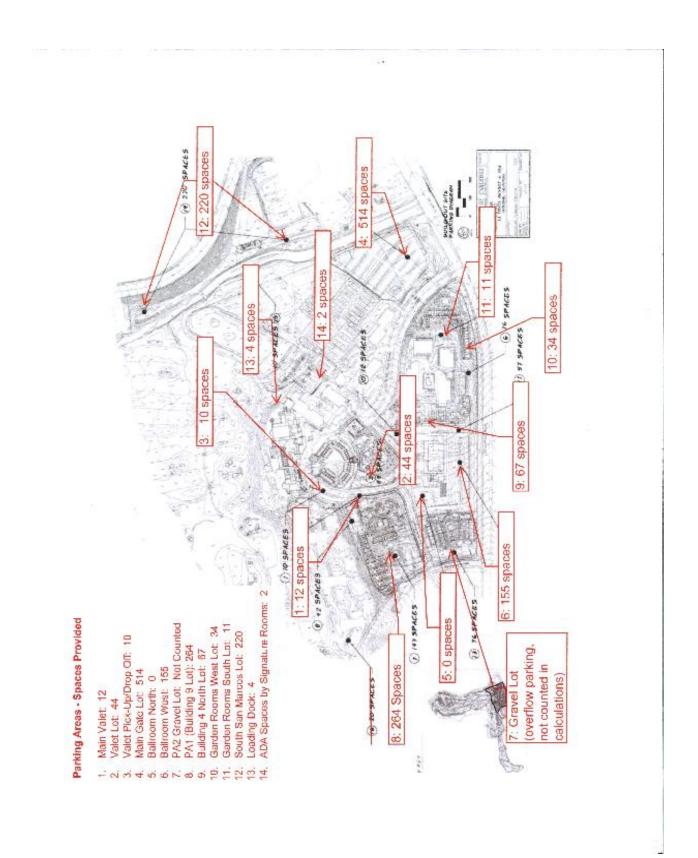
BUILT OUT SITE PARKING DIAGRAM
